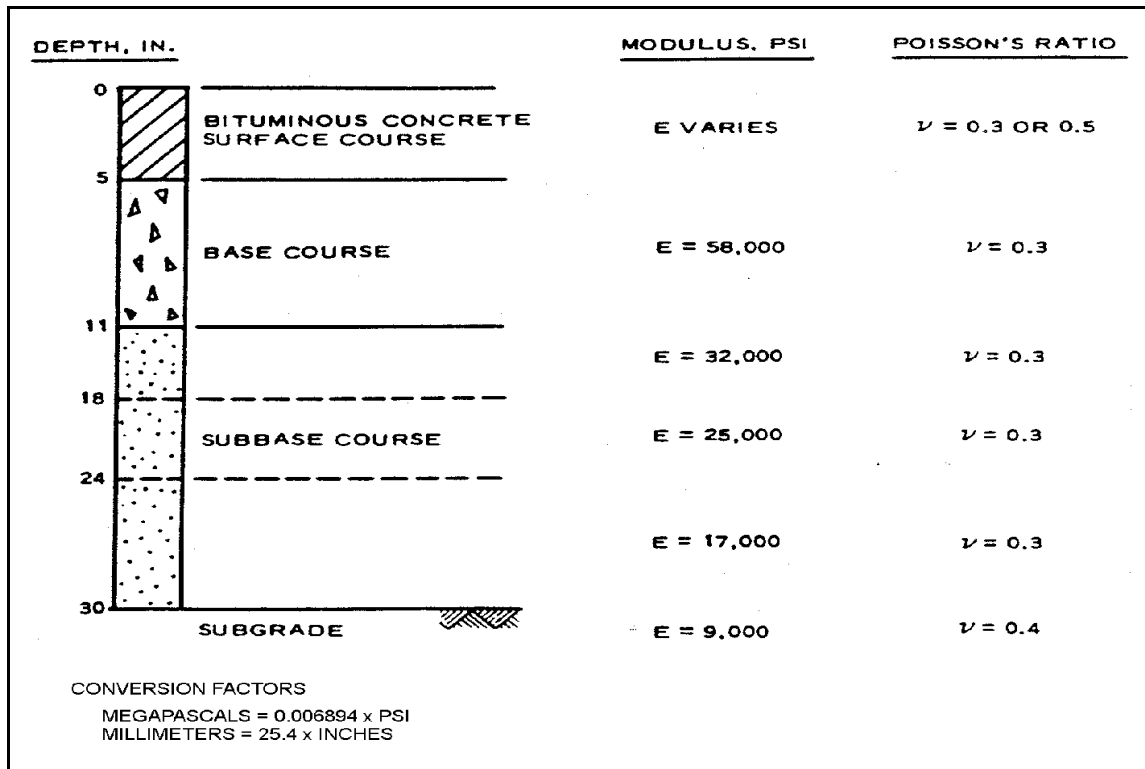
Section for pavement thickness of 760 millimeters (30 inches) for initial taxiway design
